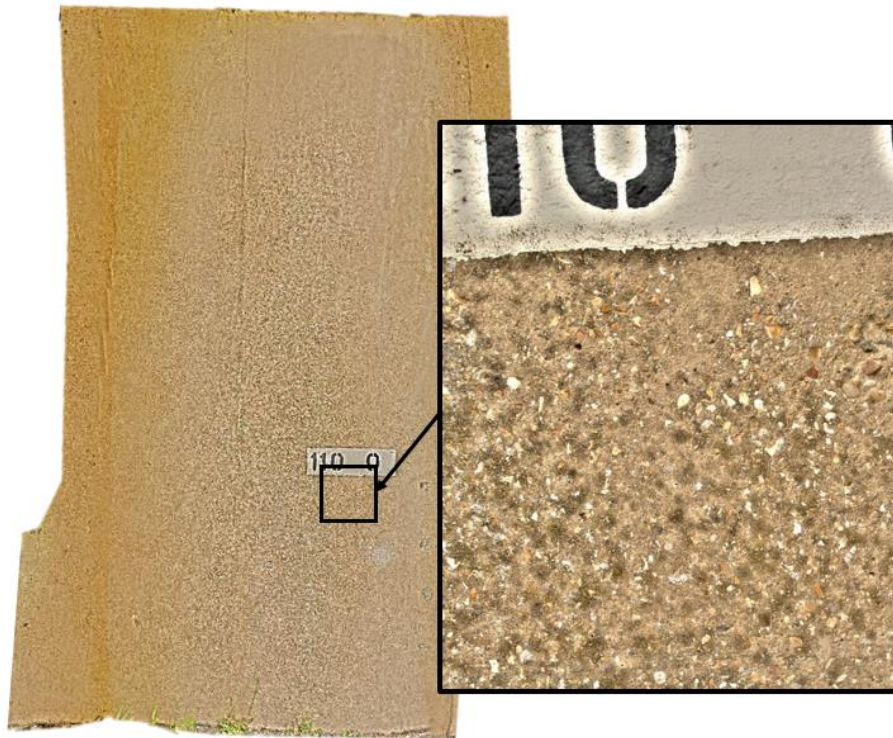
Reconstructed surface based on bridge geometry and high resolution imagery
